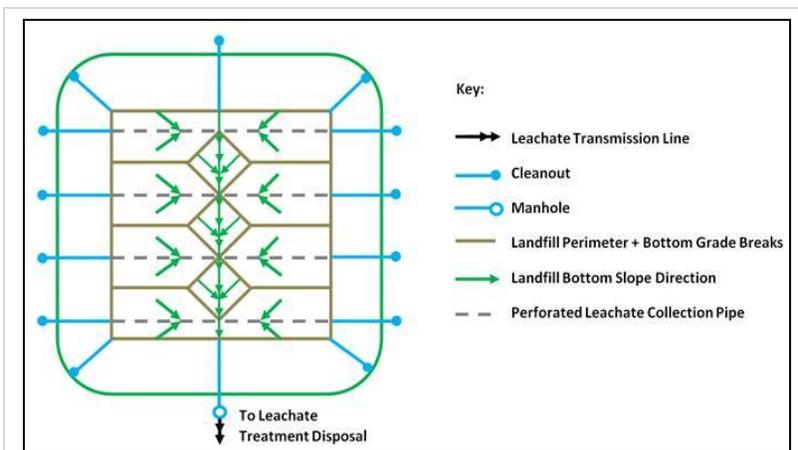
Typical Layout of Leachate Collection System (top view)
